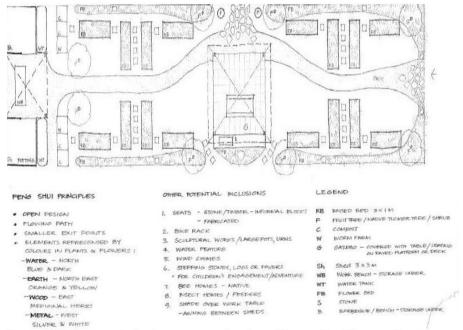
Draft concept plan for a proposed garden at Annam Road Reserve, Bayview
